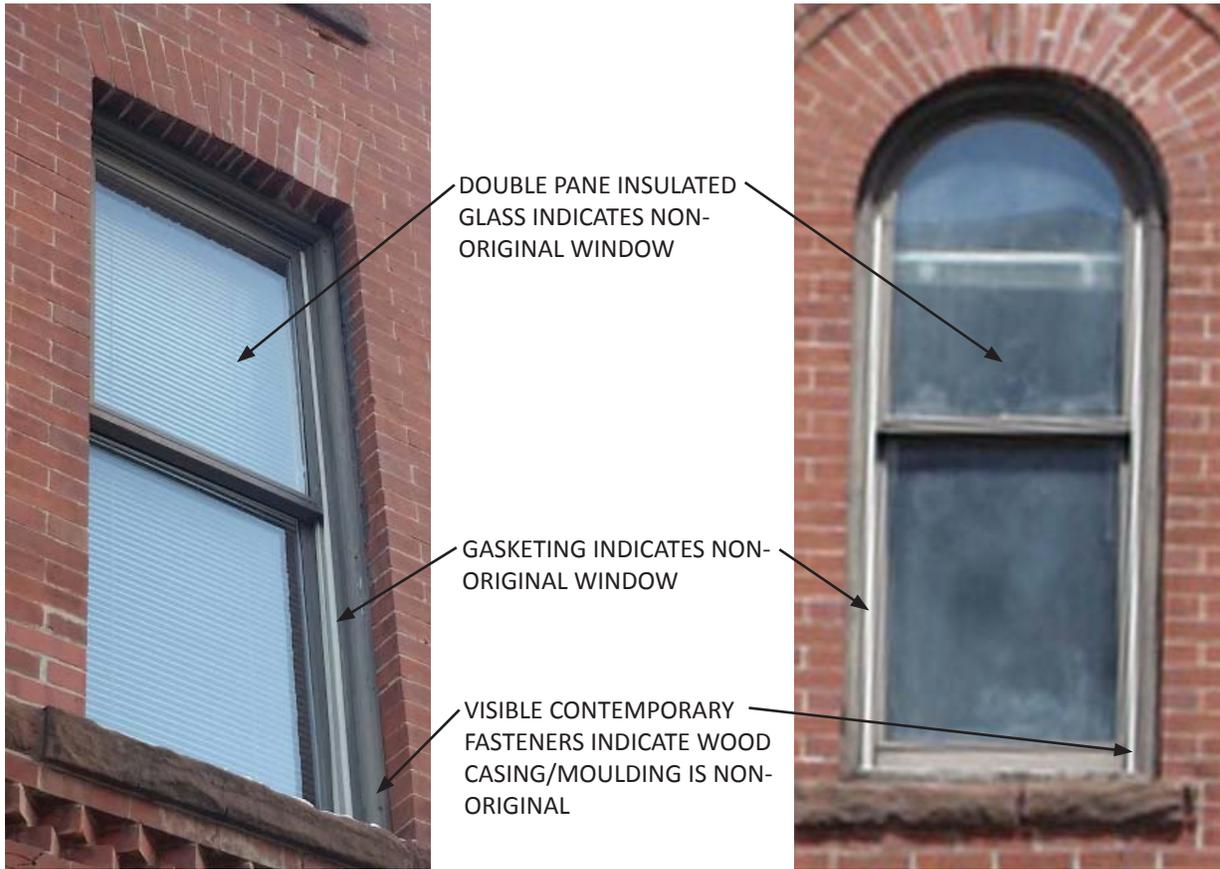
PHOTO SET 'A' - Existing non-original upper floor windows facing 1st St N
